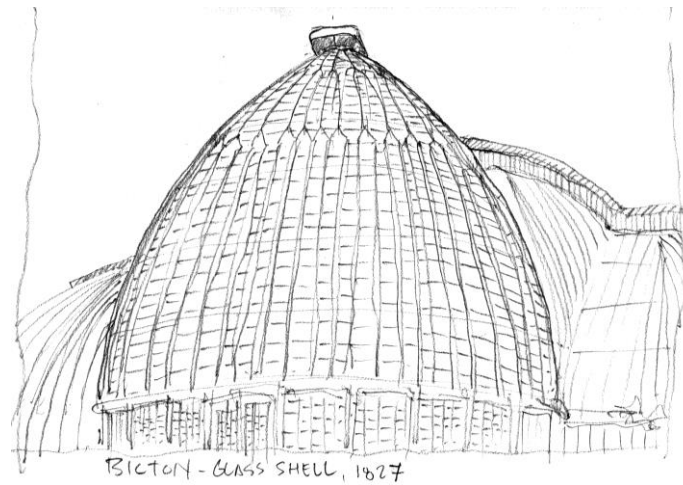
Palm House, Bicton Glasshouses, Bicton Botanical Gardens, Exeter Devon, England. 1820's. Thin wrought iron glazing bars form a flexible network supporting panes of glass which stiffen the enclosure by acting as a compressive shell.
